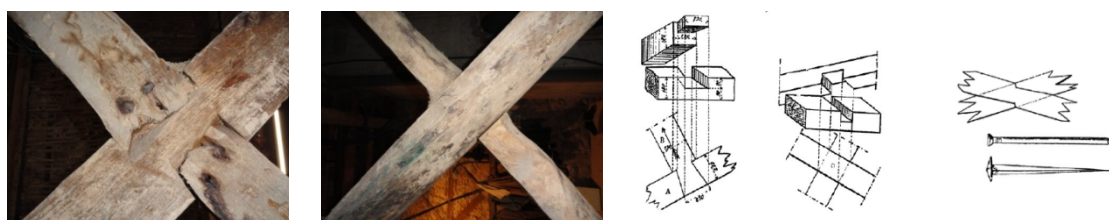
Connection between diagonal elements: notch work, assembly and nailing fixation (Segurado, nd).
